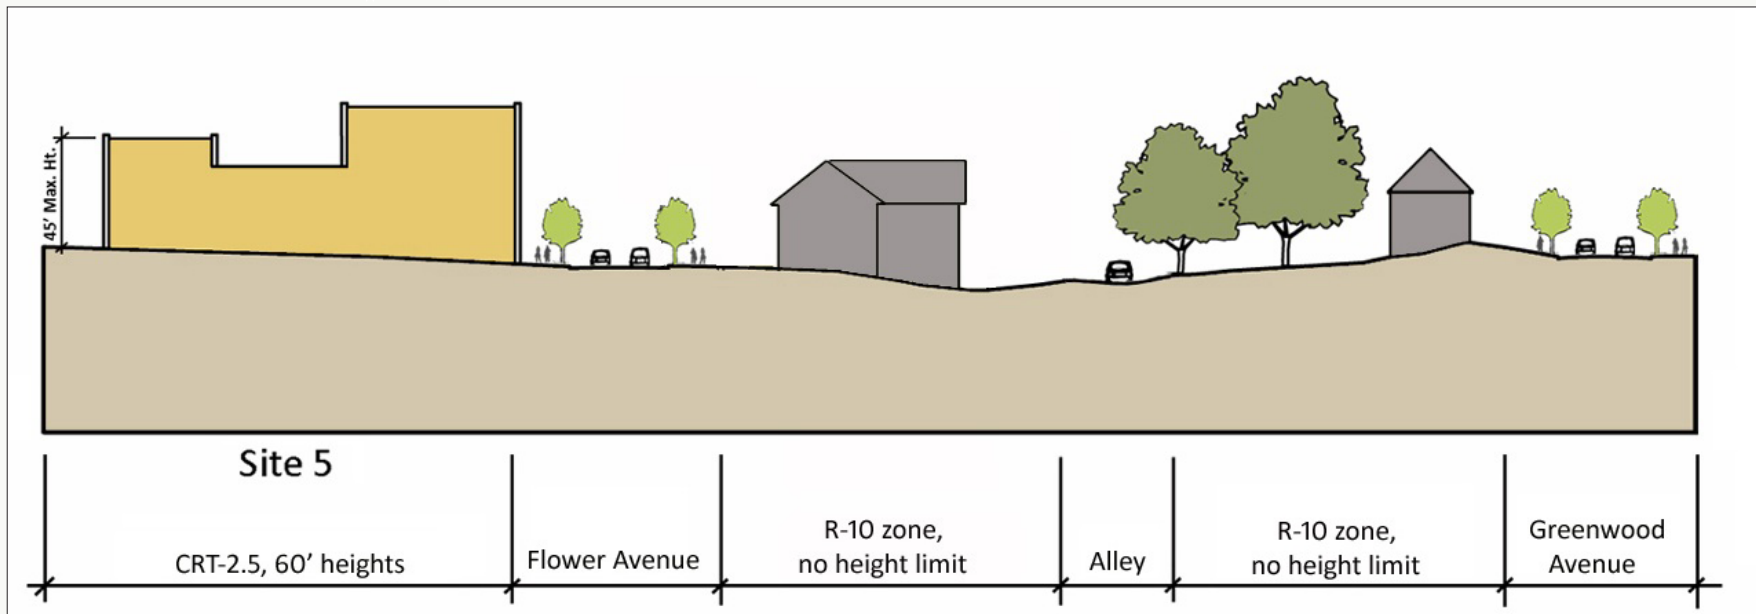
Site 5 and Greenwood Avenue Cross Section
